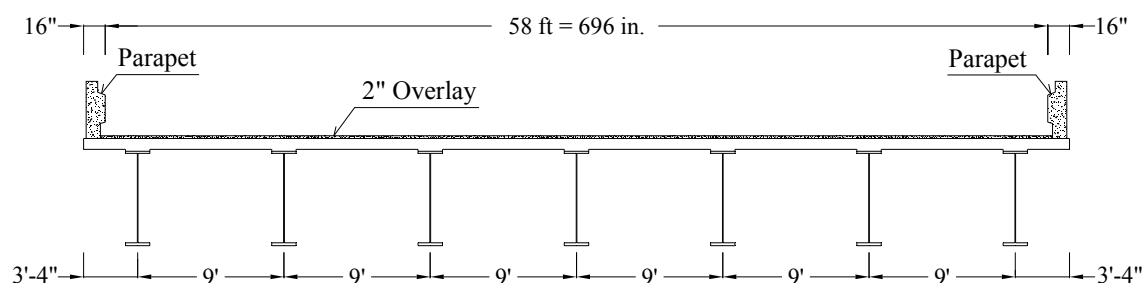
Cross Section of the Composite Steel Superstructure
